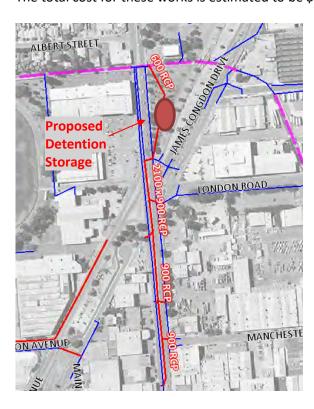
South Road, Mile End Drainage and Storage Layout
